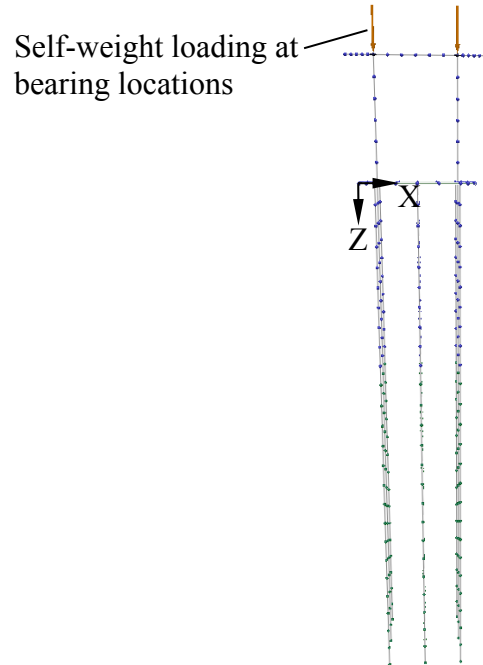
Loading applied to pier (superstructure not shown)
